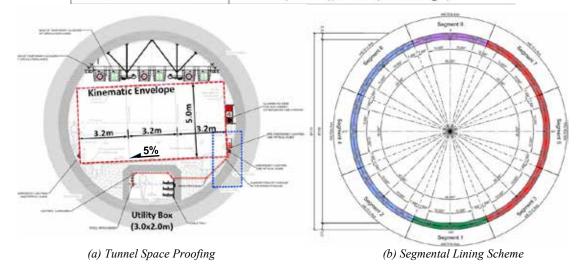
Tunnel Space Proofing and Segmental Lining Scheme
